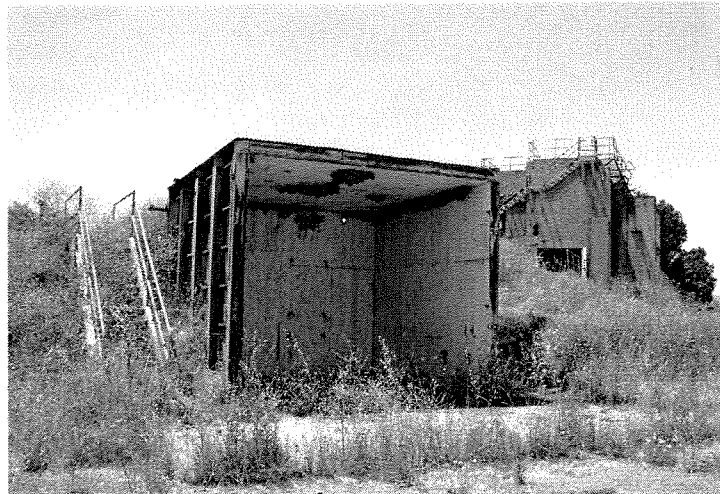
Test Cell (Unit 60), Test Stand No. 1, Alpha Test Complex, 1956-1957. Looking west. View of May 2005.
